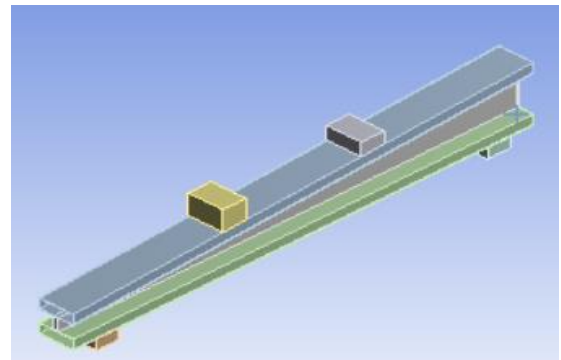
hollow flange tapered web steel beam with 10mm web thickness (HF\_10)
